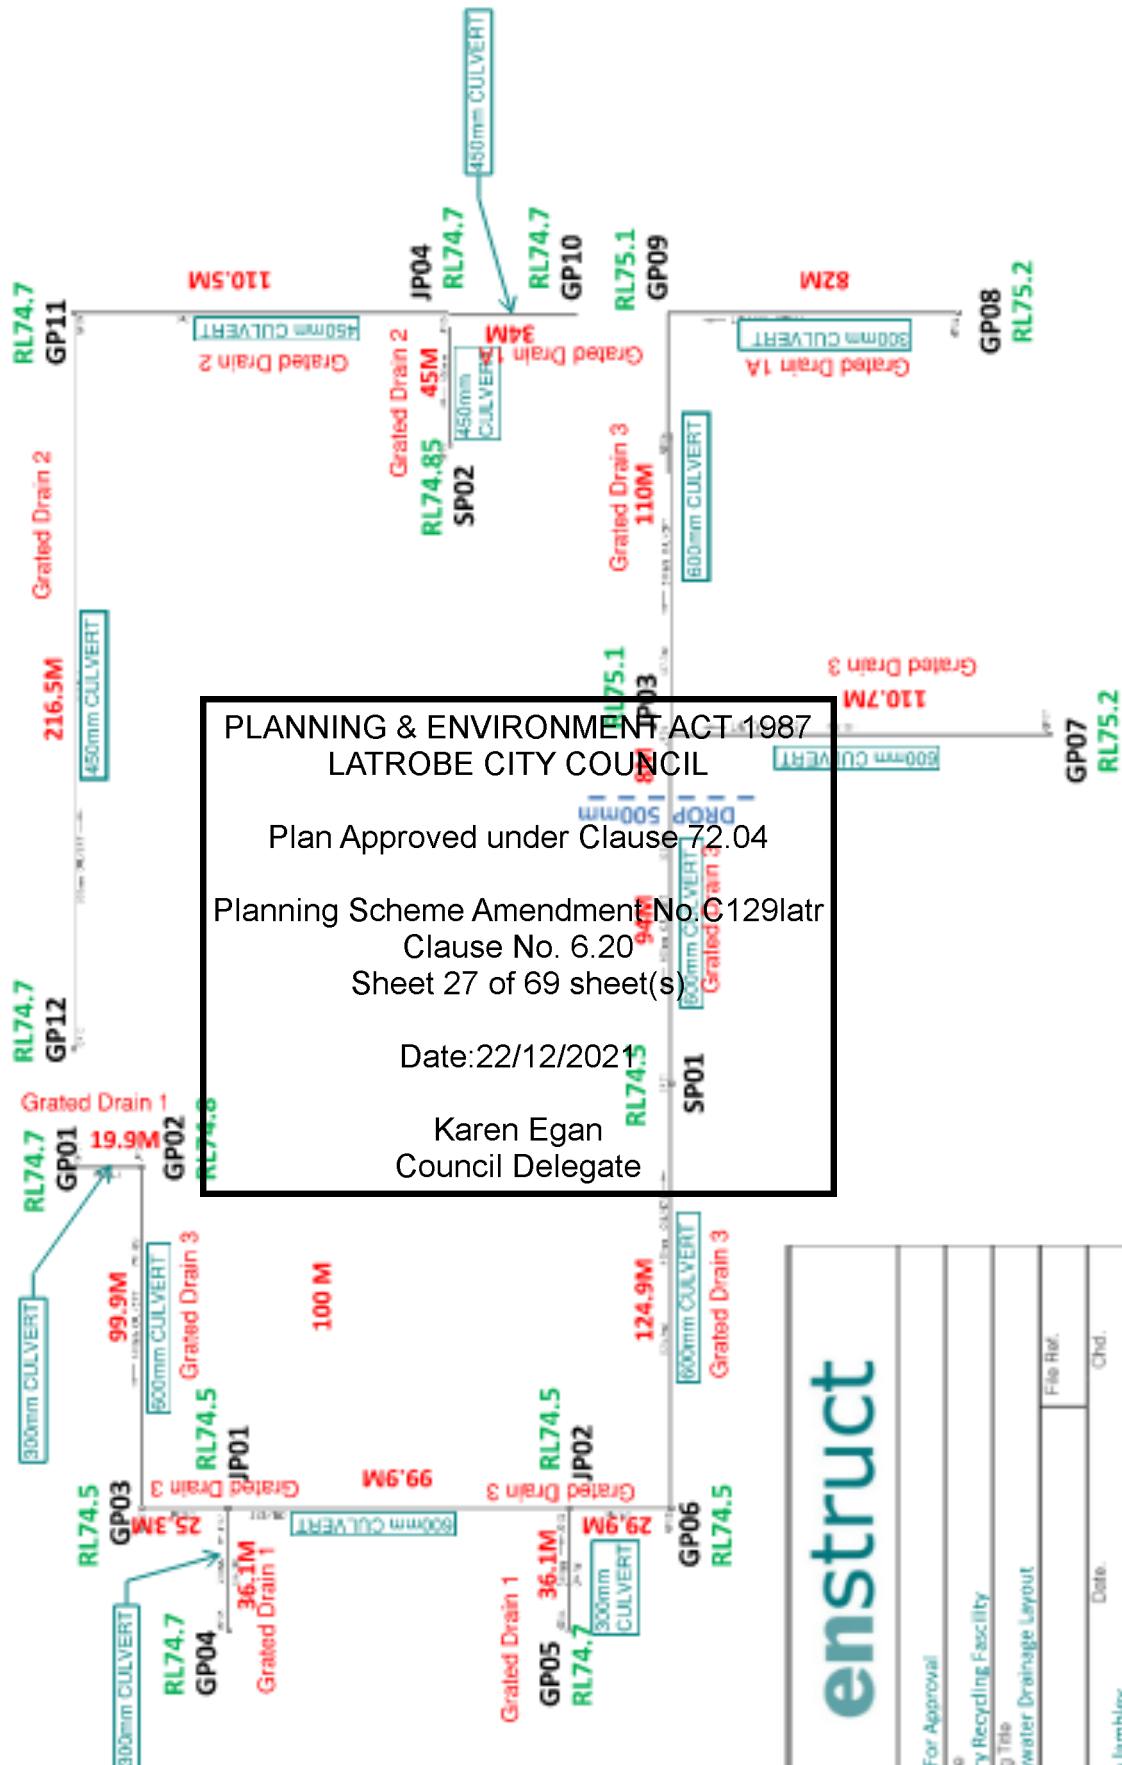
Stormwater Drainage Layout Plan with Pit and Grated Drain information
